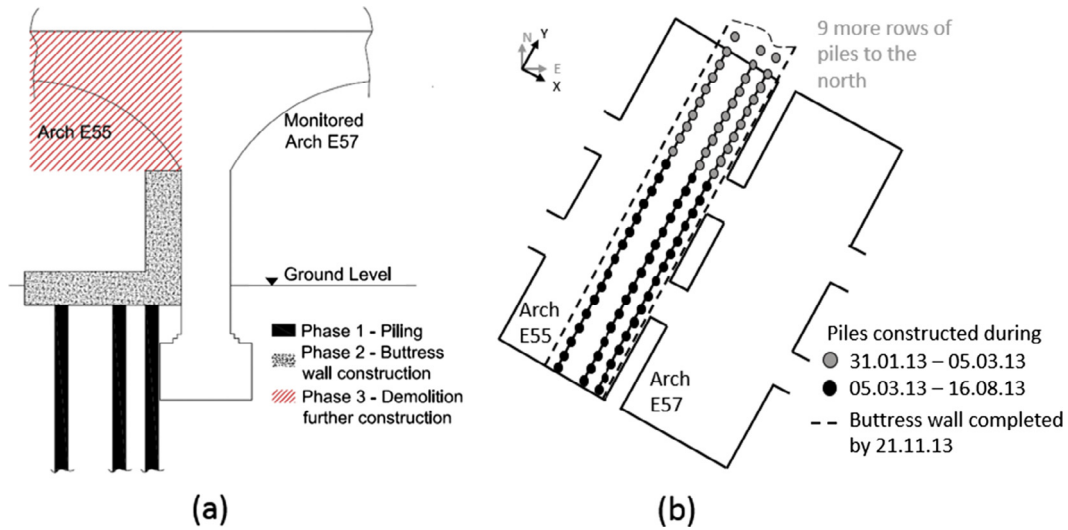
(a) Schematic and (b) plan view illustrating the piling, buttress wall construction and demolition works which caused settlements in the masonry arch E57.
